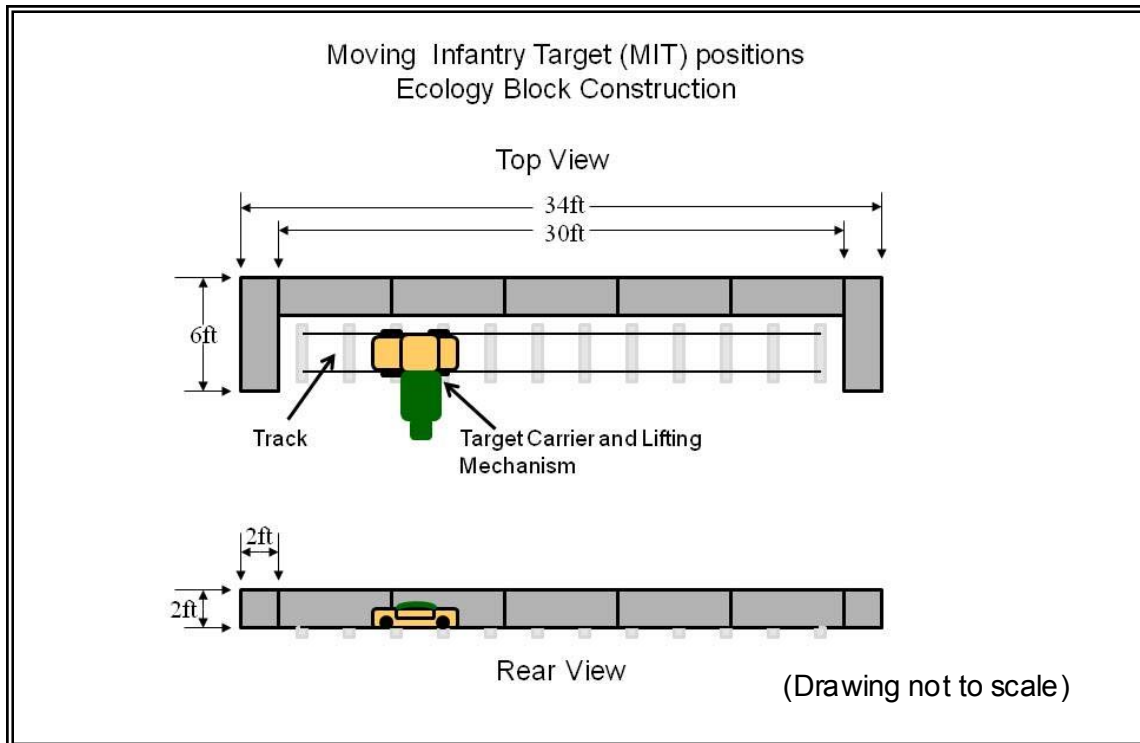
Representative MIT Emplacement Elevation Drawing
